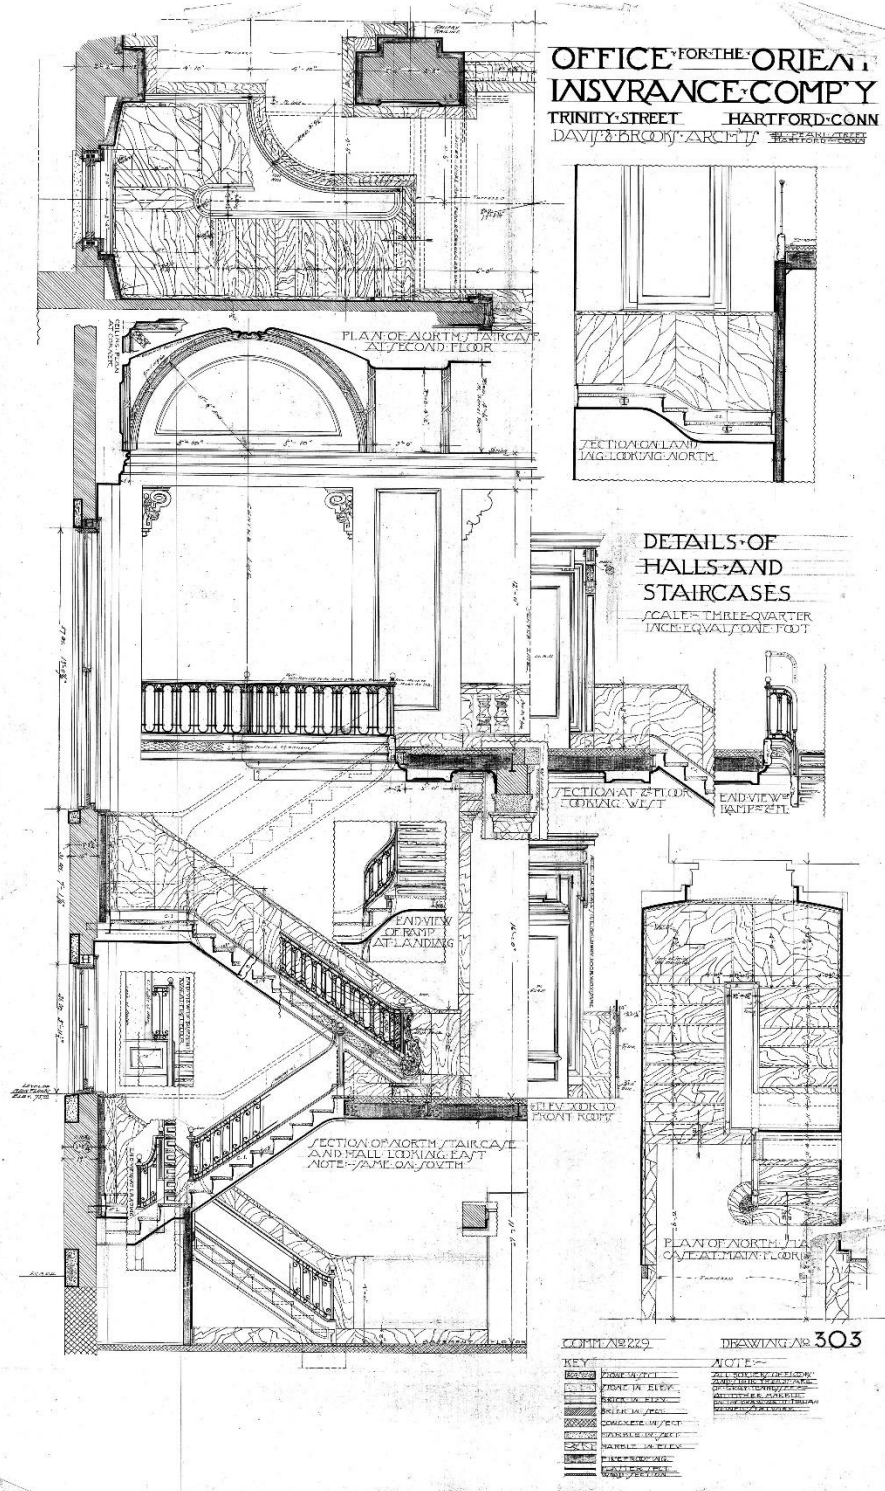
Section through original stair at west entrance of 20 Trinity Street.
